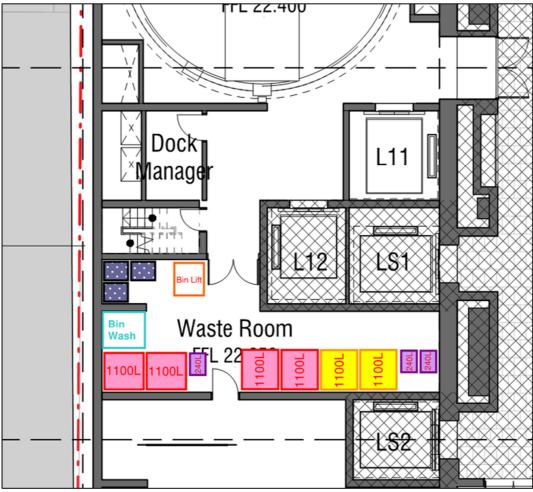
Location of South Tower central waste and recycling storage room, and proposed bin layout for lower ground level.
